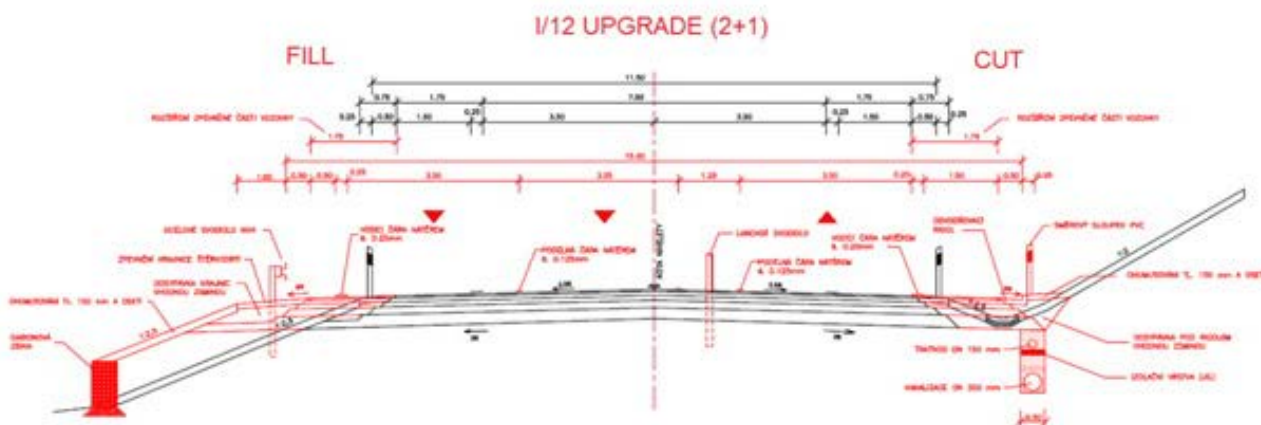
Drawing of the proposed cross-section of the I/12 road with rope guardrail installed in the median
